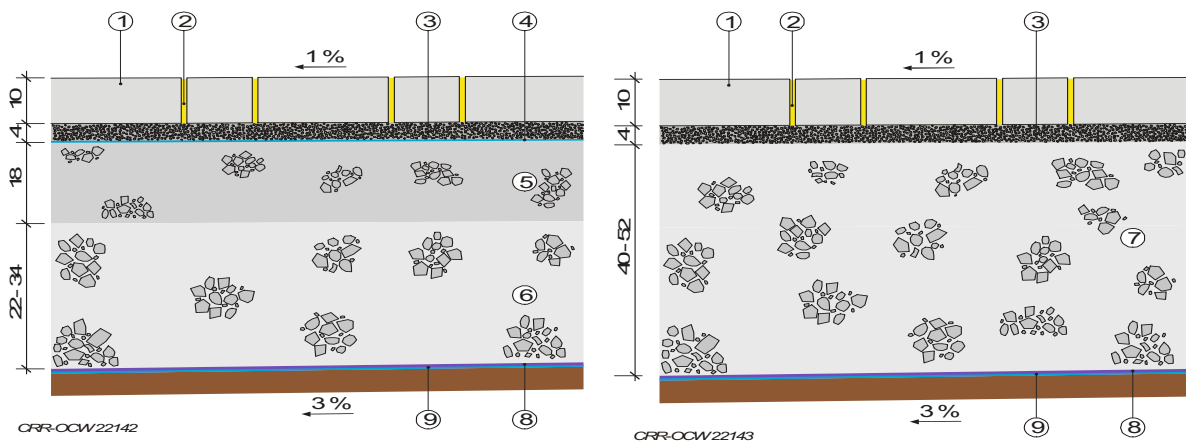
Cross sections of the structure with porous concrete paving blocks
